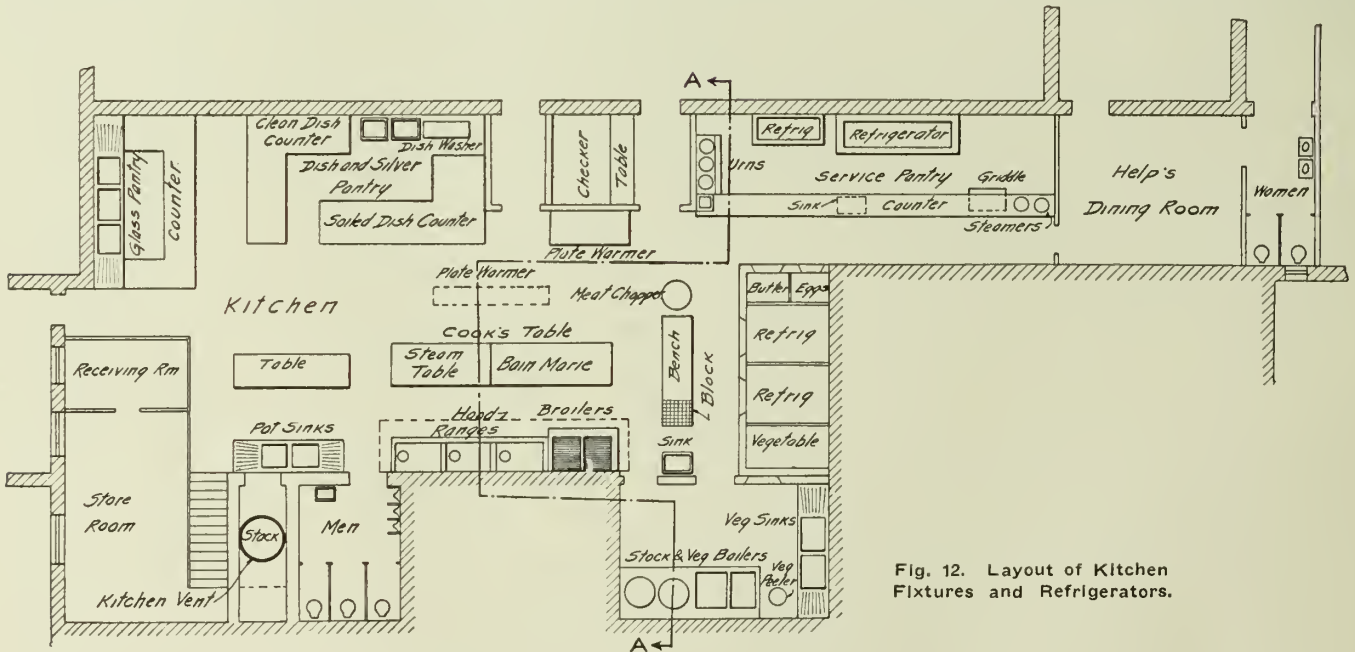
Layout of Kitchen Fixtures and Refrigerators.
